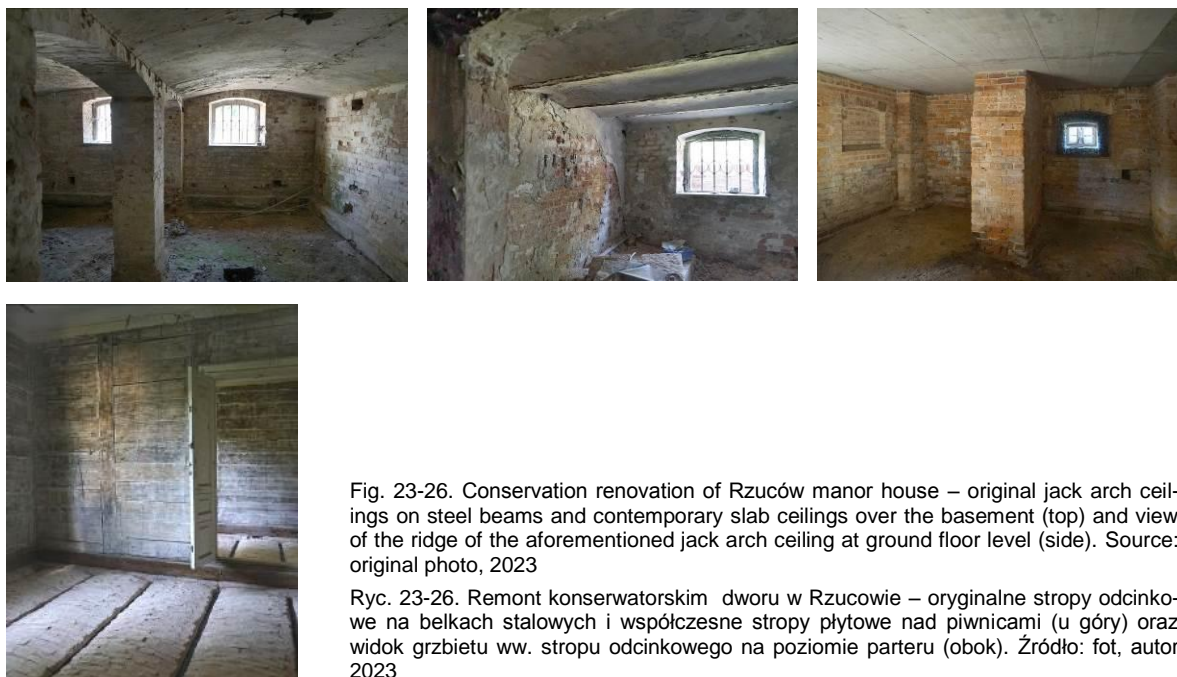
Conservation renovation of Rzuców manor house – original jack arch ceilings on steel beams and contemporary slab ceilings over the basement (top) and view of the ridge of the aforementioned jack arch ceiling at ground floor level (side). Source: original photo, 2023
